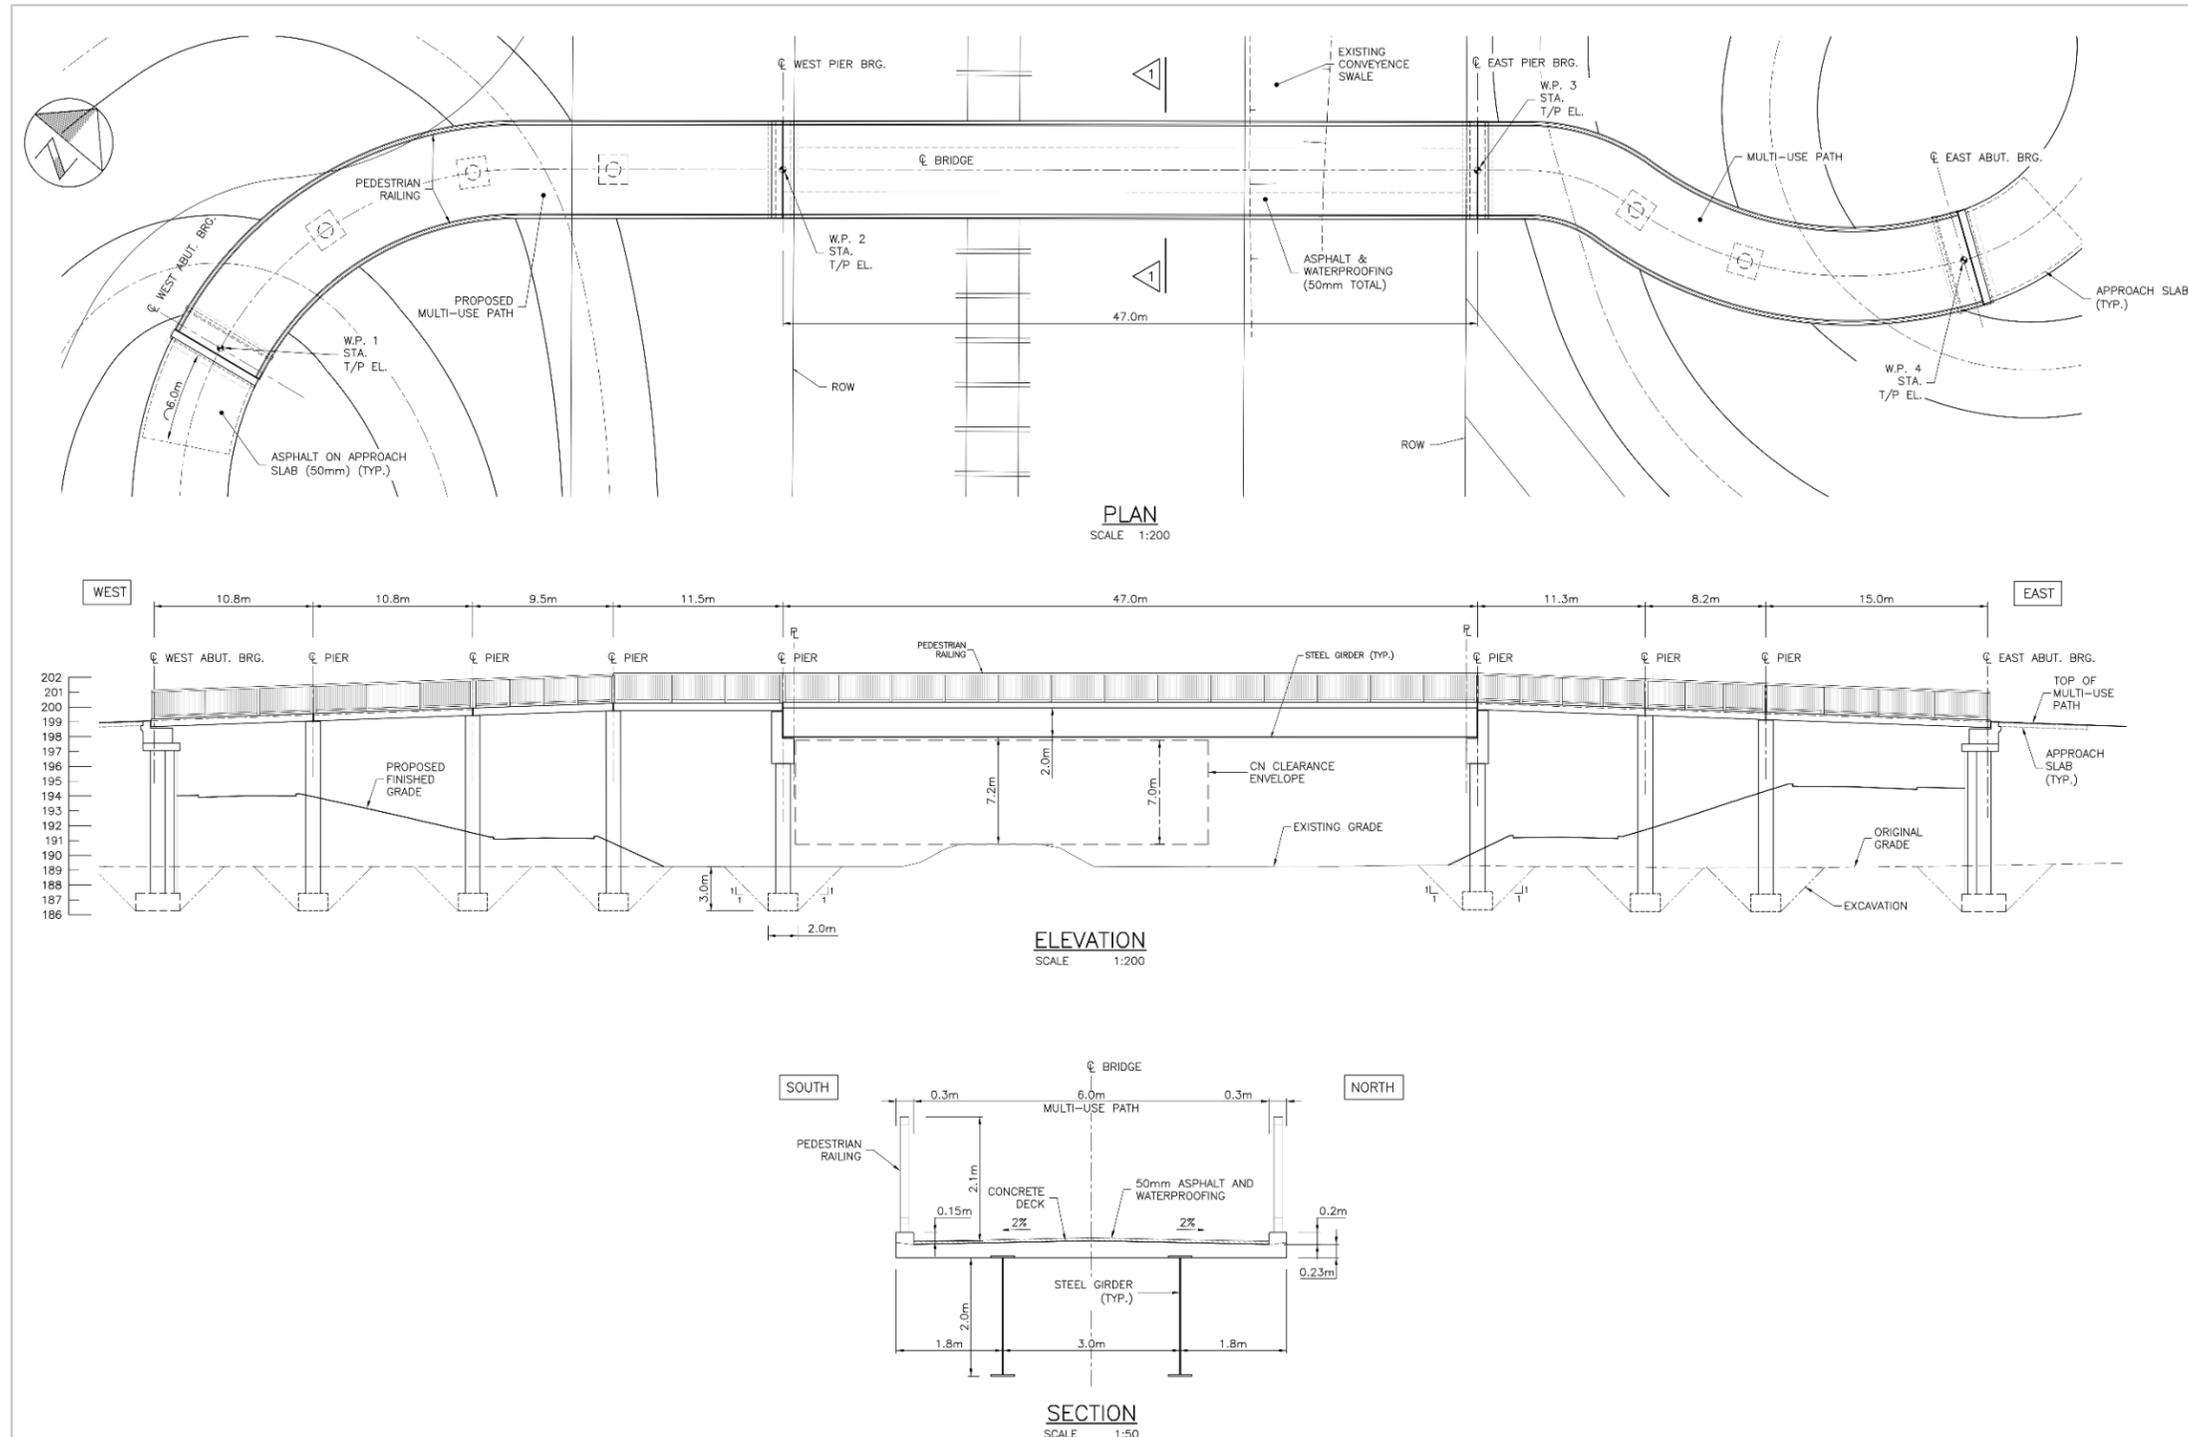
Alternative B2: Girder Bridge with Approach Alternative 2, 3 or 4
